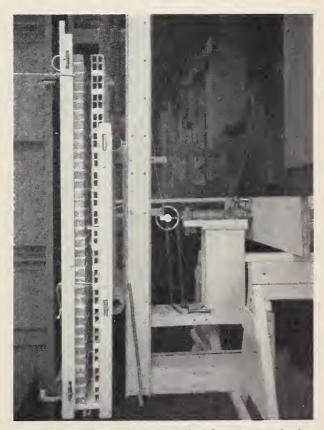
Brick-tile cavity wall under transverse load. Loading rollers at quarter span are shown to the right of the wall.
